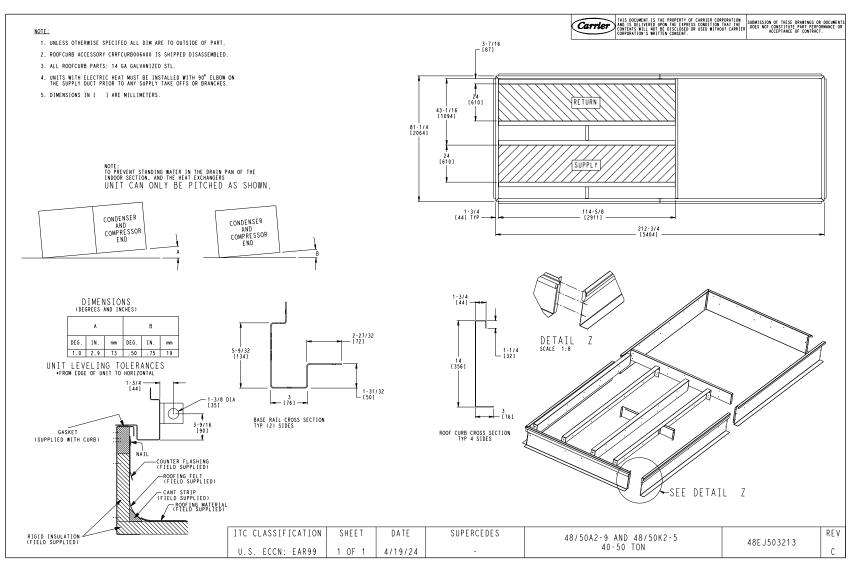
Roof Curb — 50K, Sizes 40-50
